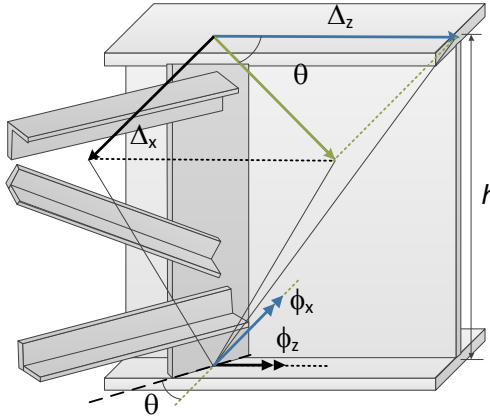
Girder top flange deflections and girder rotations at a fixed bearing location on a skewed bearing line.
